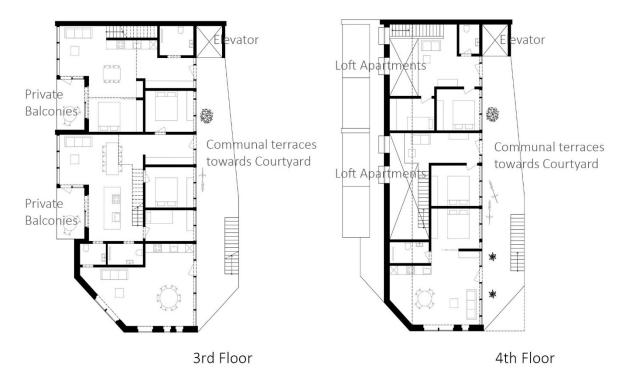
Floorplans of addition at Frederiksborggade (Duplex loft apartments), Scale 1:250 (A4)
